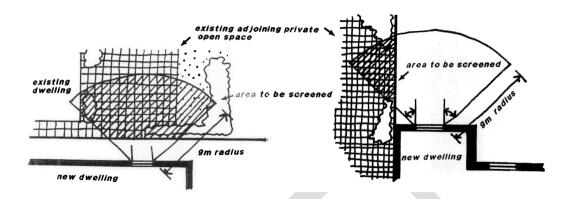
SCREENING VIEWS TO ADJACENT PRIVATE OPEN SPACE
